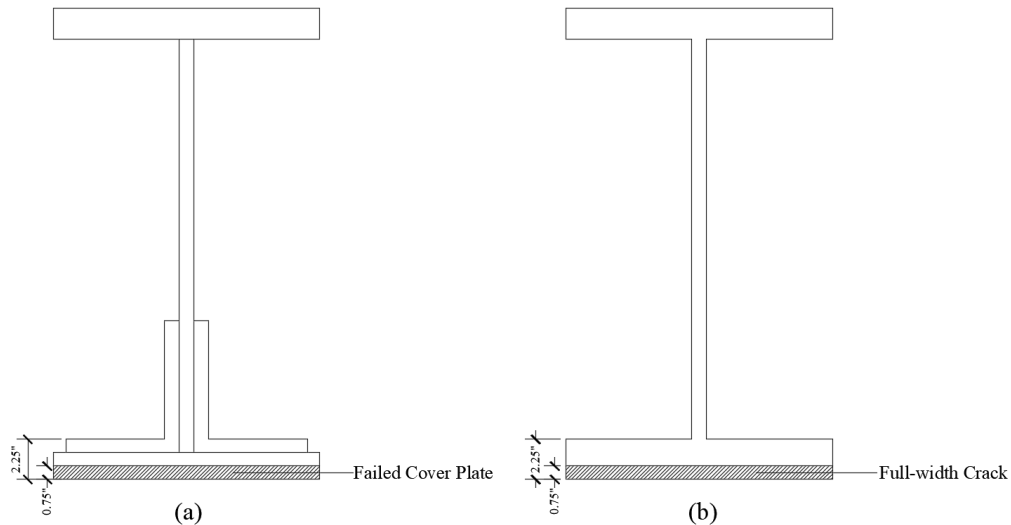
(a) Built-up Section (b) flexural I-shaped member with Full-width Crack
